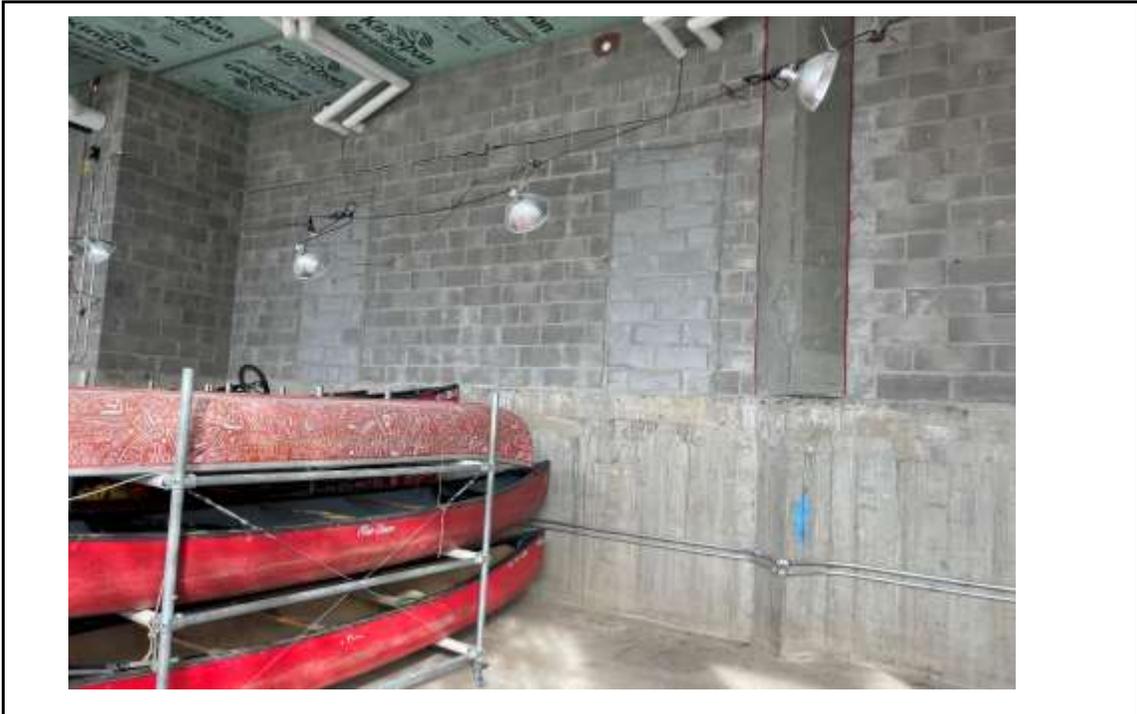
Concrete slab in subgrade boat house located within the southern portion of the building, facing northwest. 05 December 2023.
